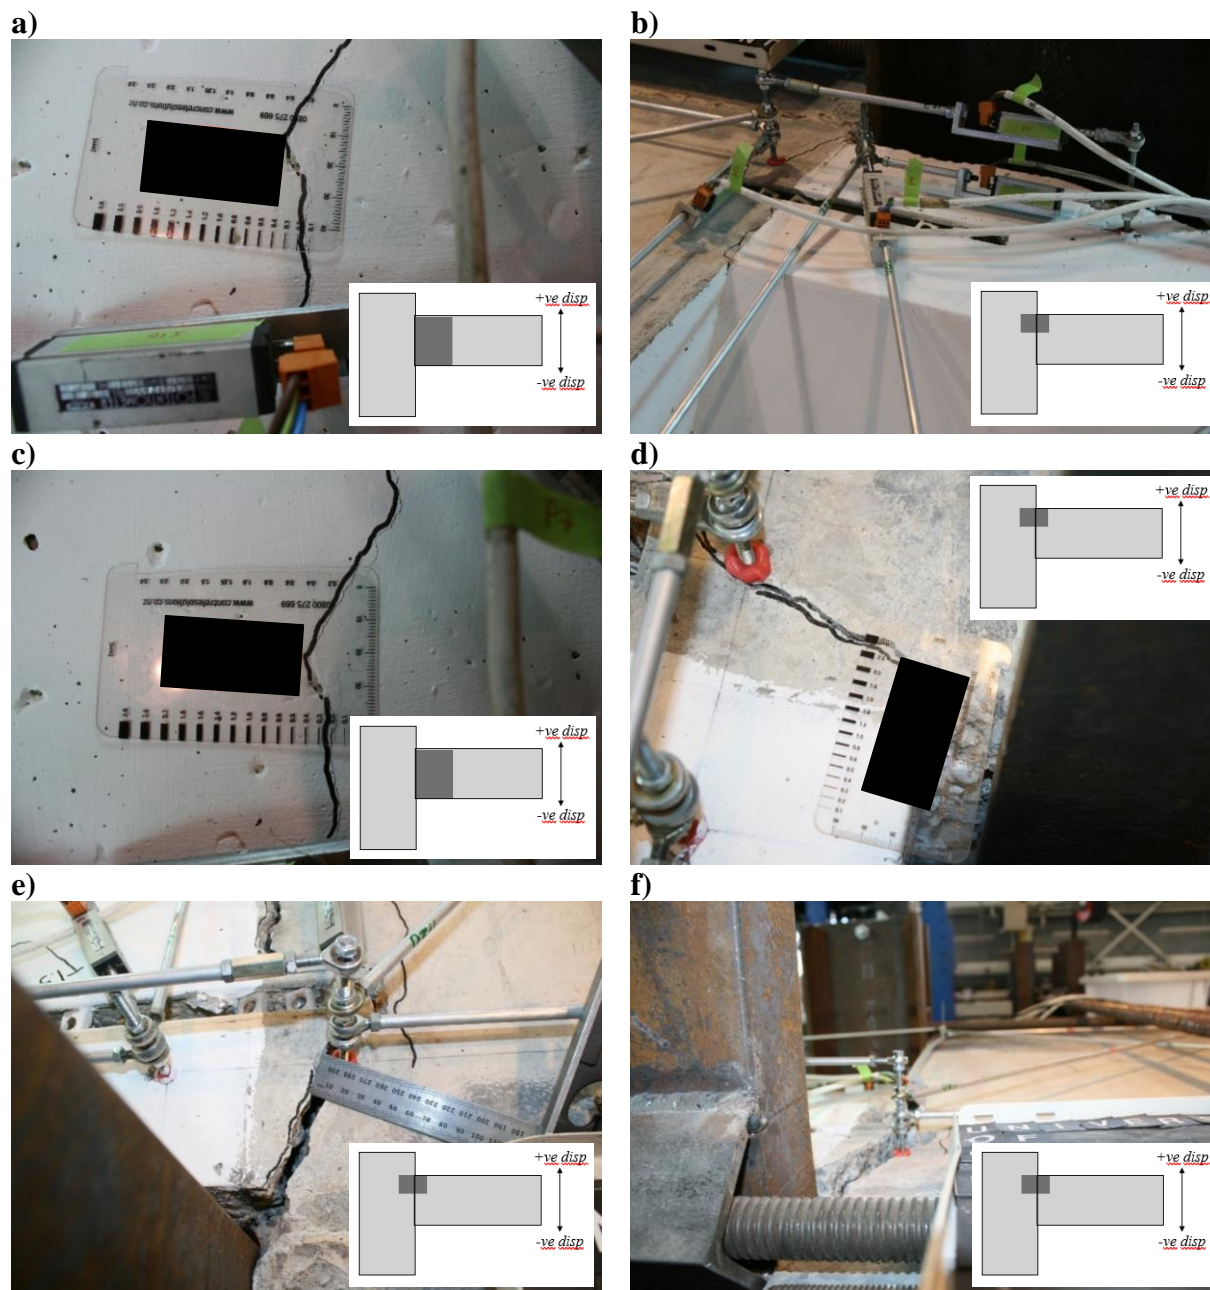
a) Crack 0.1 mm wide at 0.2% beam rotation; b) initiation of diagonal crack due to socket for fixing non-structural components; c) crack 0.1 mm wide increasing to 0.2 mm at 0.75% beam rotation; d) diagonal crack due to socket developing further to up to 3 mm wide at 1% beam rotation; e) diagonal crack at socket 10 mm wide at 1.5% beam rotation; f) vertical dislocation at the diagonal crack at 1.5% beam rotation.
